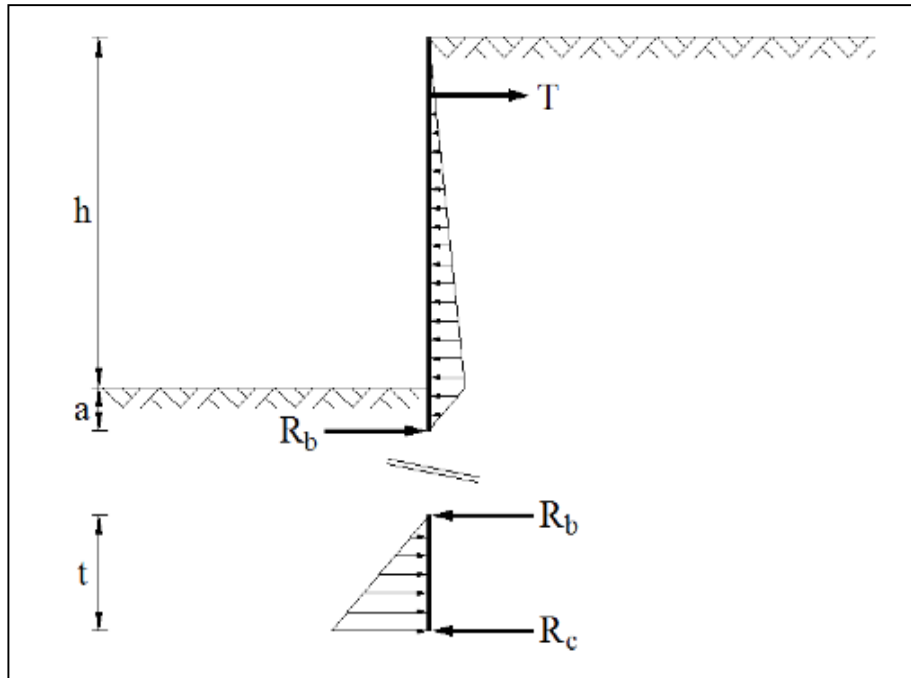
Blum's equivalent beam for anchored sheet pile wall design (Torrabadella 2013)
